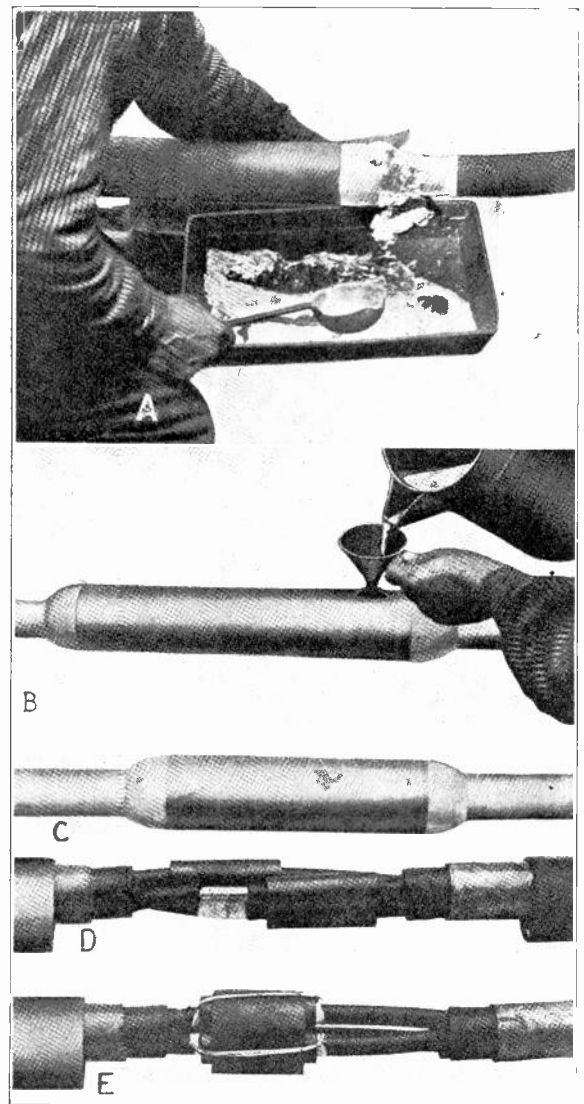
"A" shows method of "wiping" the joint between the sleeve and sheath of a lead covered cable. "B", Pouring the finished splice full of hot insulating compound. "C", Finished splice with sleeve in place. "D" and "E", Small inner sleeves of insulating material are often used to separately insulate the several conductors.
